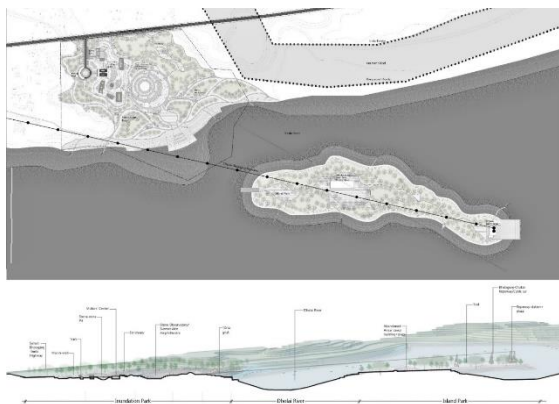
Proposed design intervention with Remediation Park and sight-seeing opportunities for tourists in Master plan and section (Source: Author)
